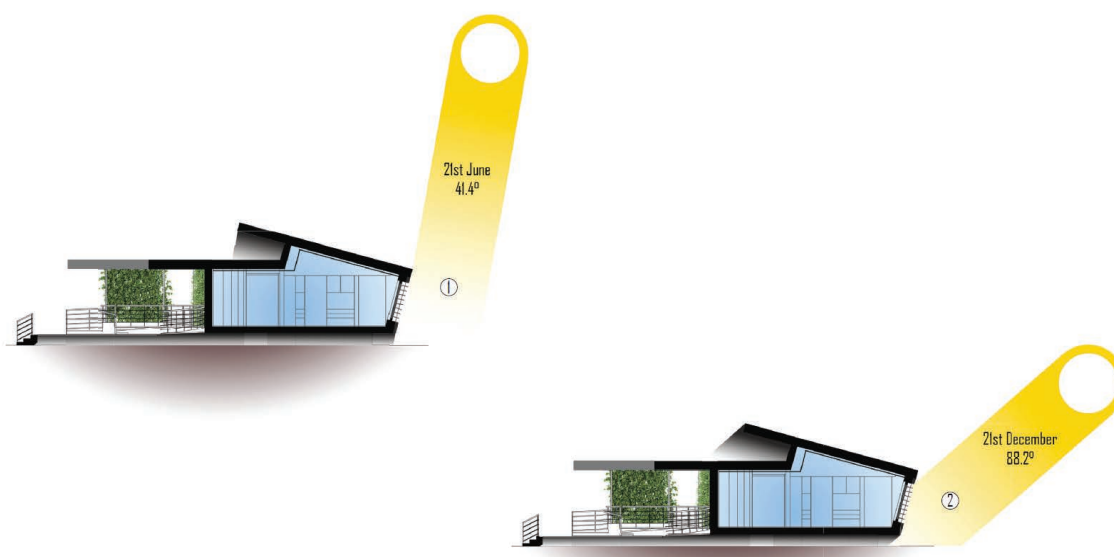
The South façade was ventilated and had several windows (Team VIRTUe 2019).
